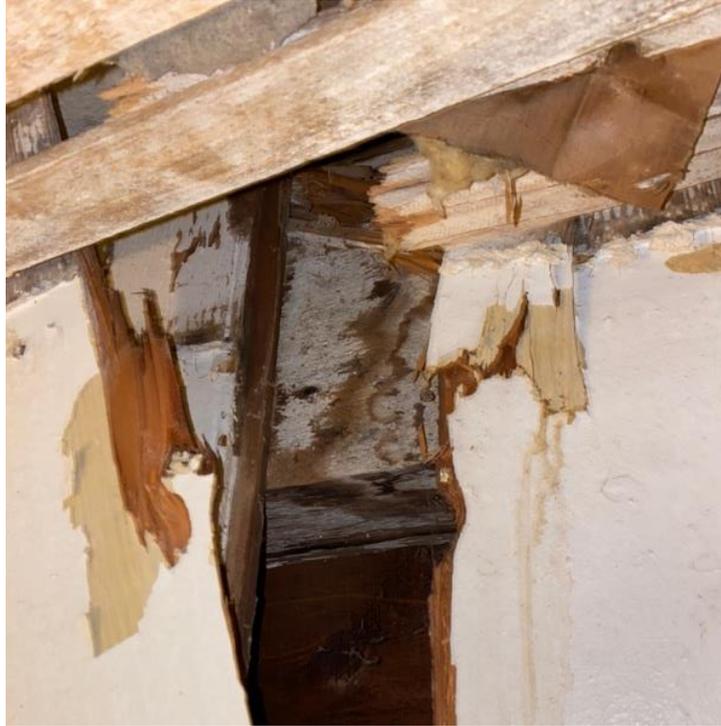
Whitewashed framing member visible under wall paneling (*Grant Cunningham, 2022*).
